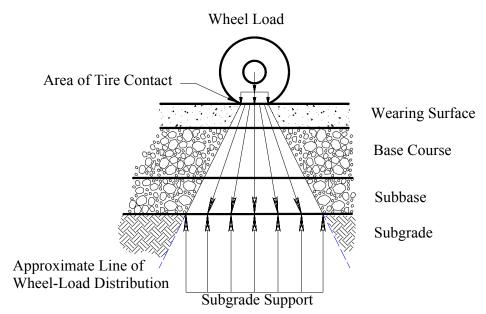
DISTRIBUTION OF LOAD STRESS IN FLEXIBLE PAVEMENT.
